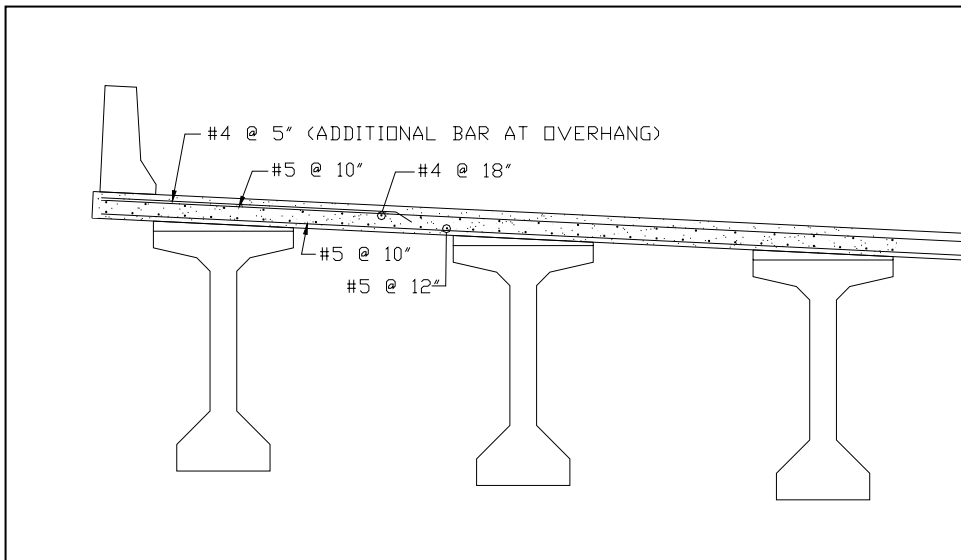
Required reinforcement for LRFD in Spans no. 2 and no. 3
